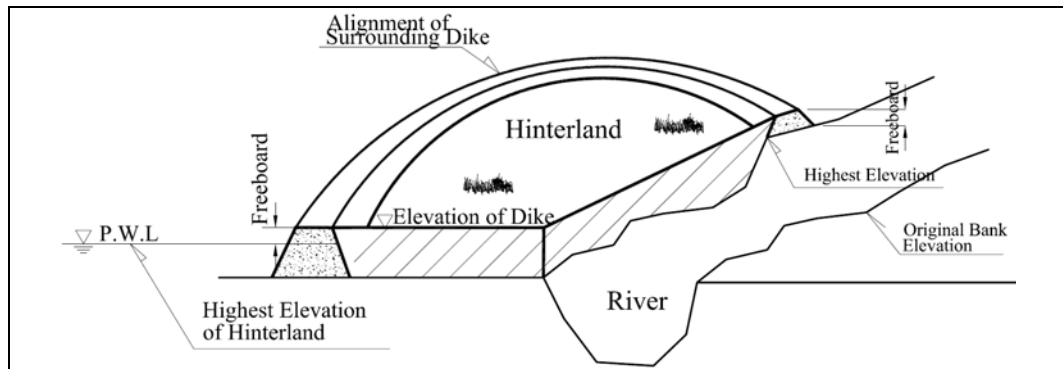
P.W.L. and Elevation of Surrounding Dike
